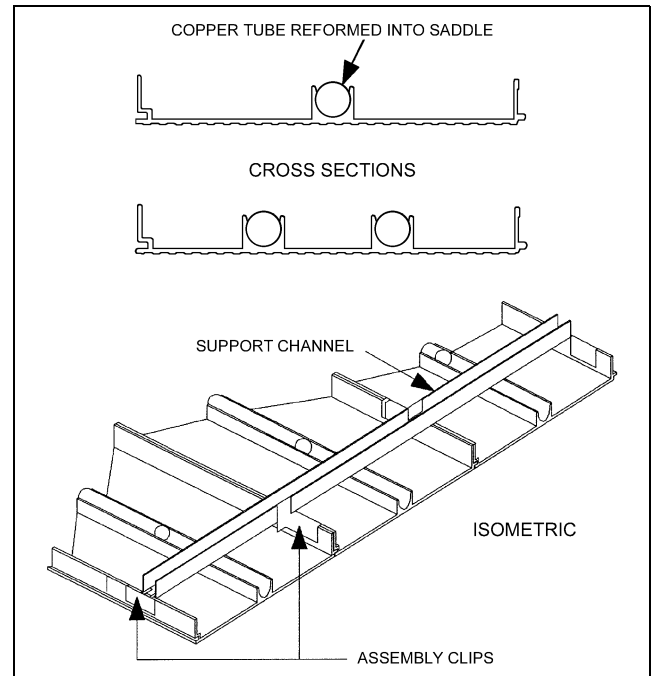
Extruded Aluminum Panels with Integral Copper Tube
